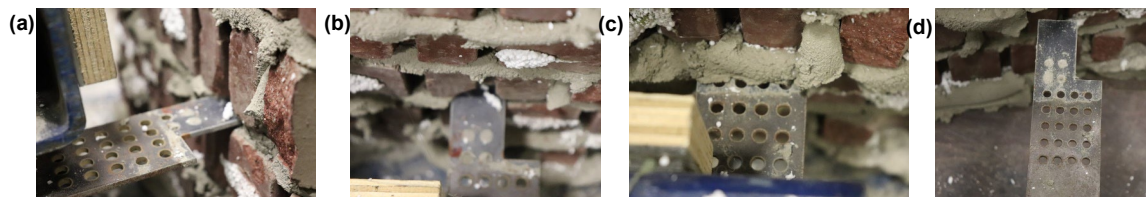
T-PH.CL-1 after testing of (a) elevated side view, (b) top view, (c) alternative top view, (d) top view after connector removal from veneer
